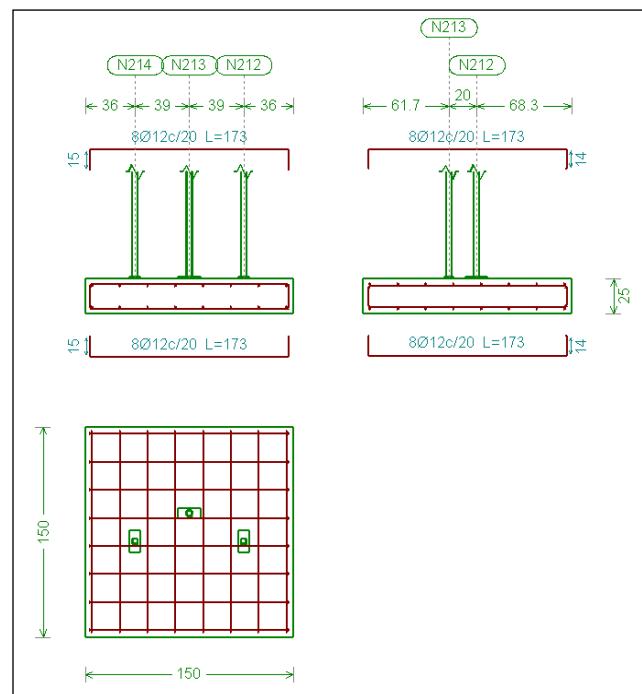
Foundation to support the anchors groups formed by type A and type B anchor plates.
